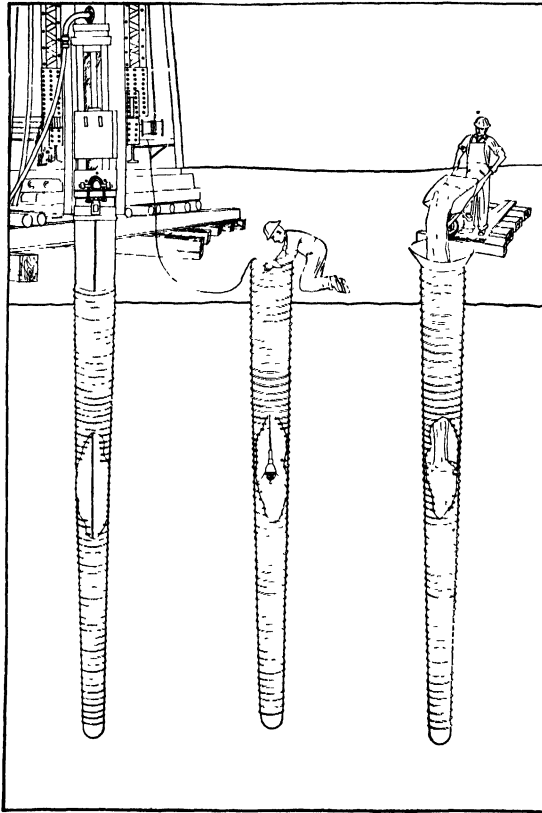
Steps in the construction of a standard Raymond concrete pile. Old type of pile driver on skid rollers. (Courtesy of Raymond Concrete Pile Co.)
